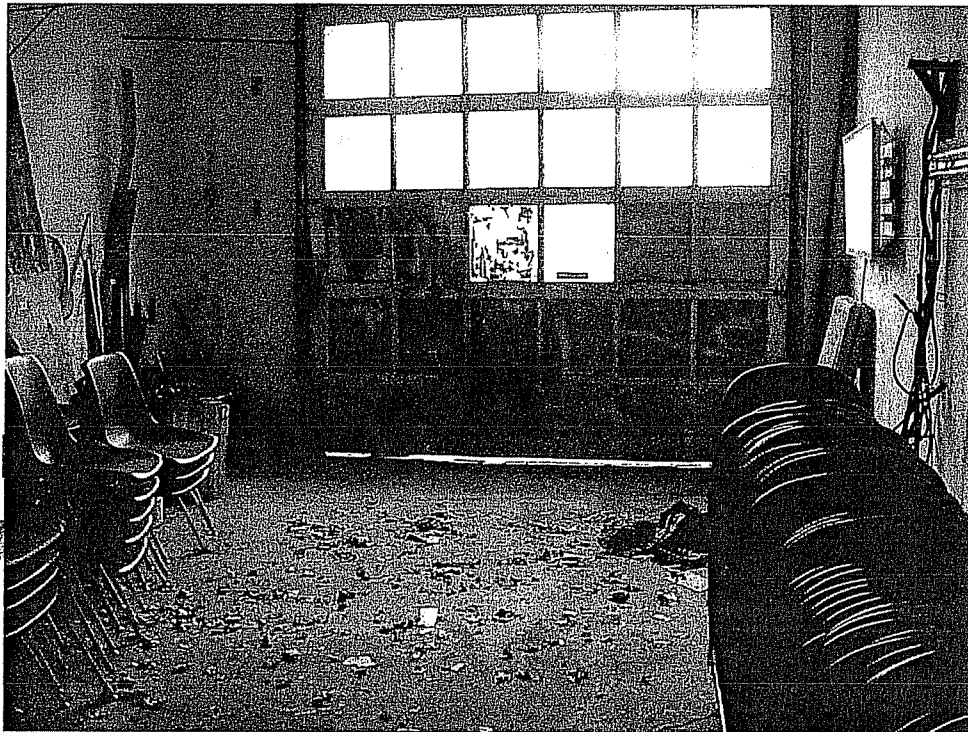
Interior of former "Bill's Key Shop" garage bay, facing west.
